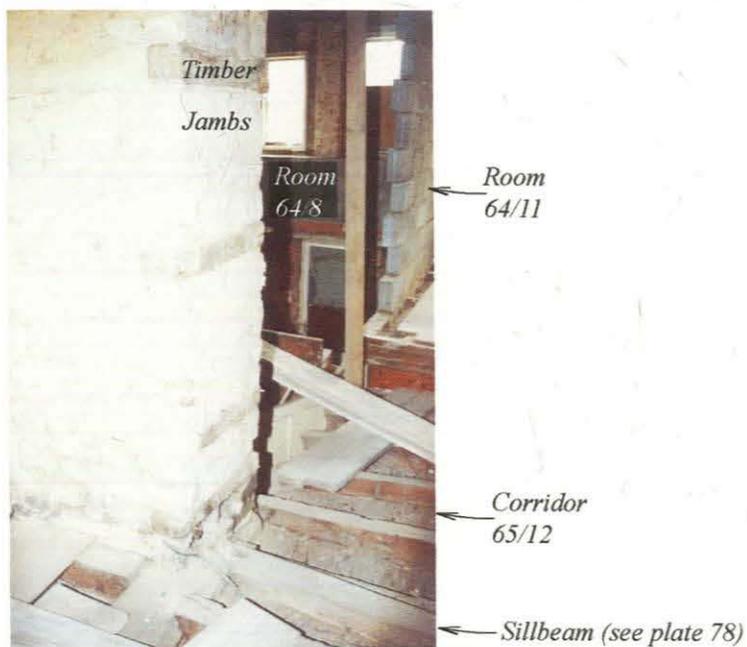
Corridor 65/12, no.65, first floor, looking southwest from the corridor, view of the northern end of the rubble wall which forms the division between Rooms 64/8 & 64/9. Note the ashlar jambs and horizontally-laid sections of timber built into the wall end.
